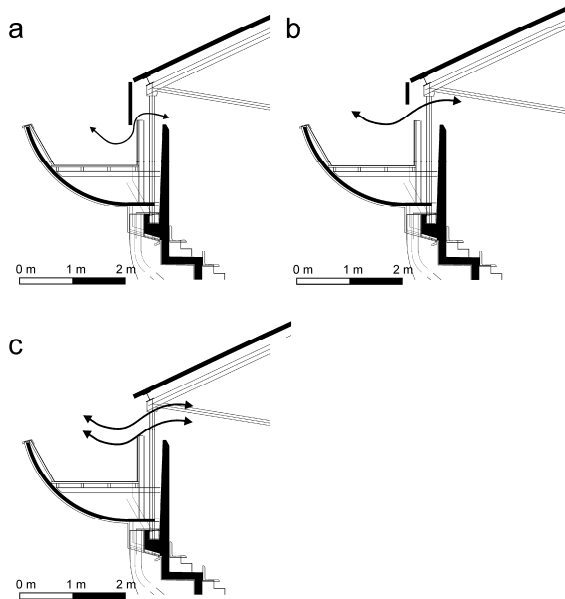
Cross-sections of the ventilation opening between the steel roof construction, the gutter and the concrete stand; (a) current configuration; (b) configuration 2 (half of the steel sheets removed); (c) configuration 3 (steel sheets removed entirely).
